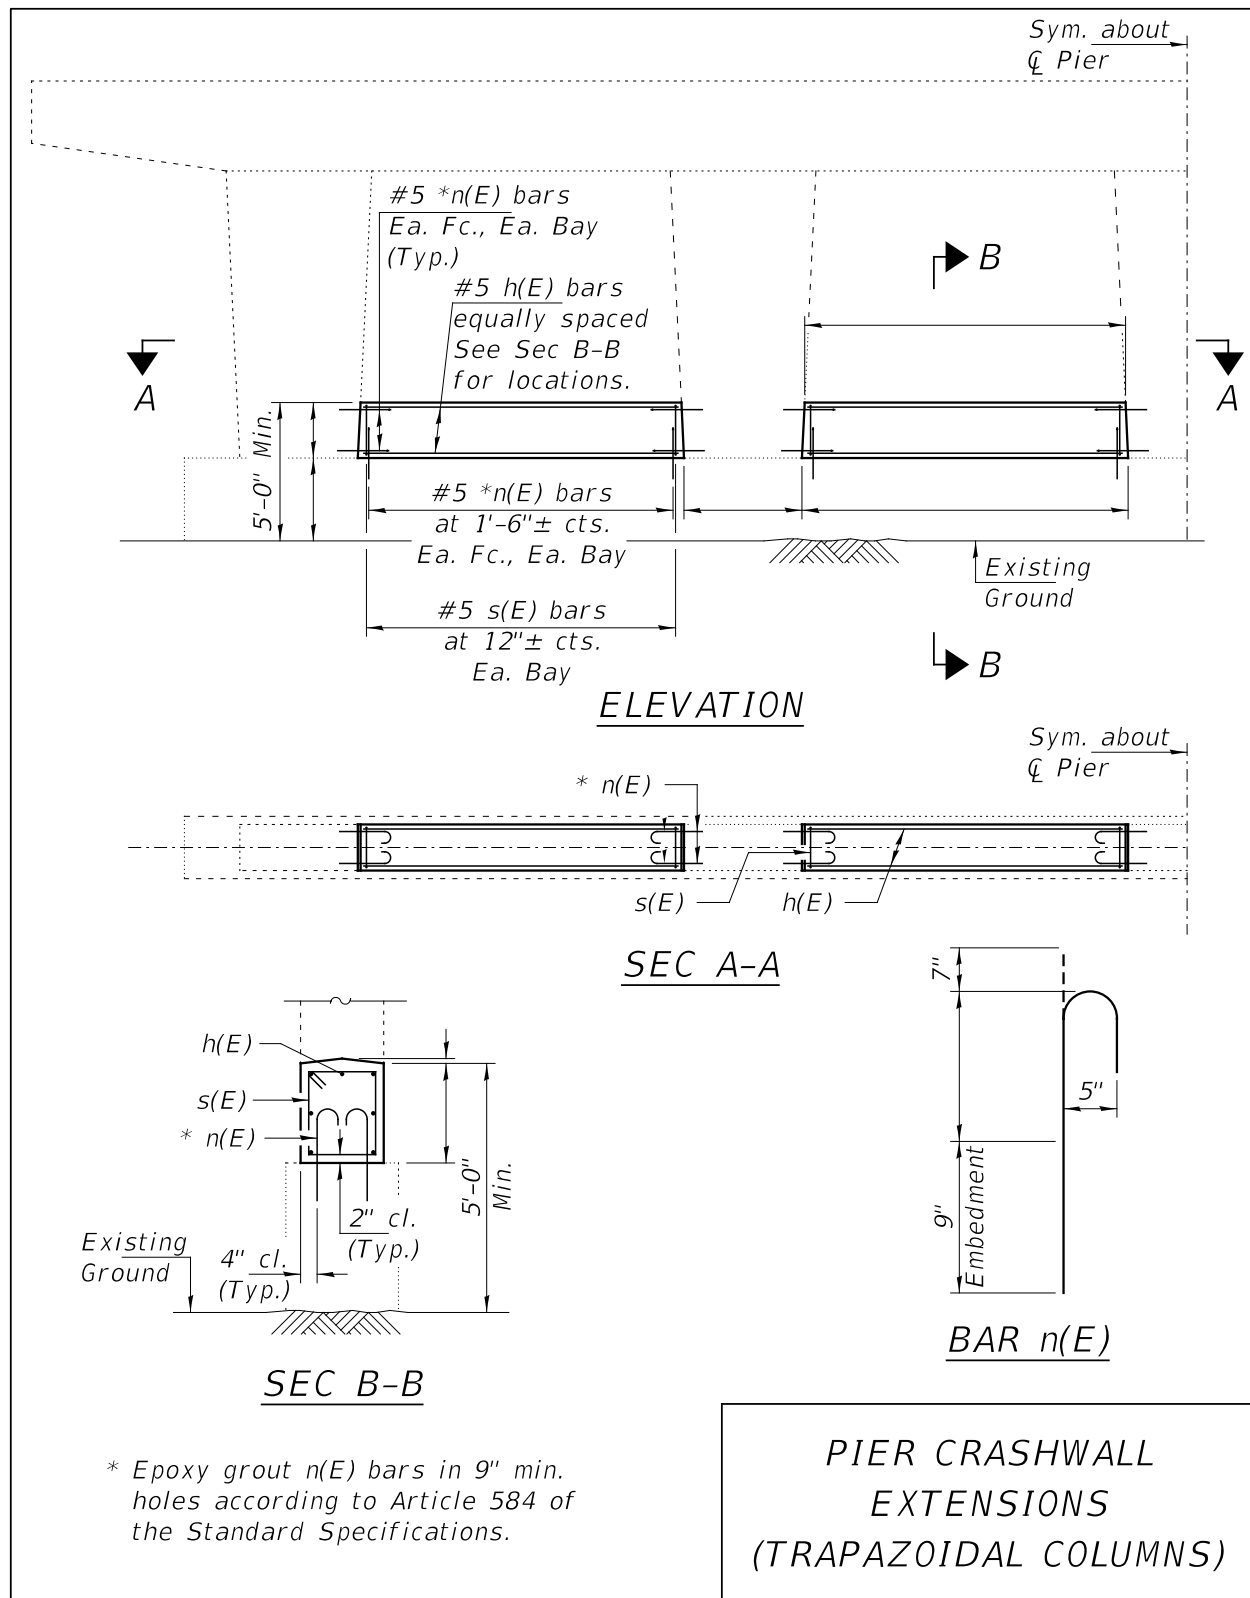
Pier Crashwall Extensions (Trapezoidal Columns)
